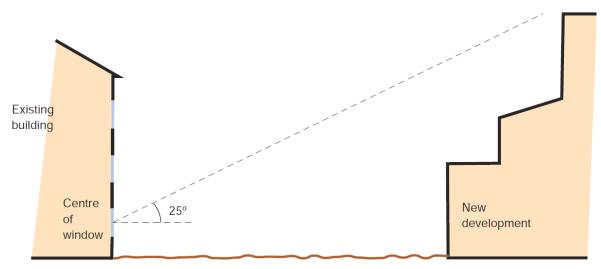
Section perpendicular to a main window wall of an existing building showing a new development subtending an angle of less than 25° to the horizontal from the centre of the lowest window. (© BRE Report 209)
